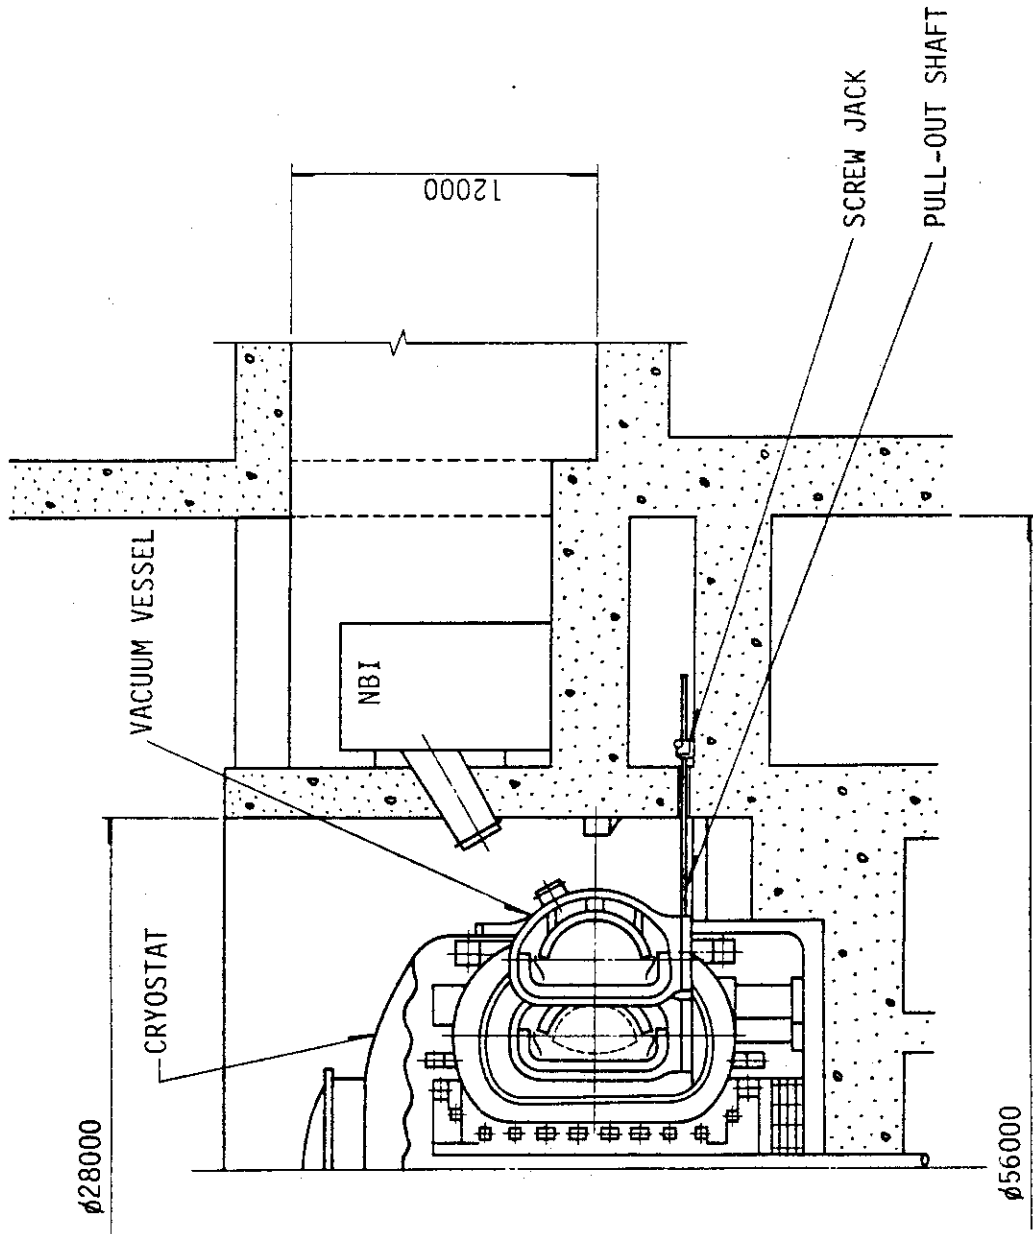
Transfer Mechanism in Radial Direction for Vacuum Vessel with Shaft
